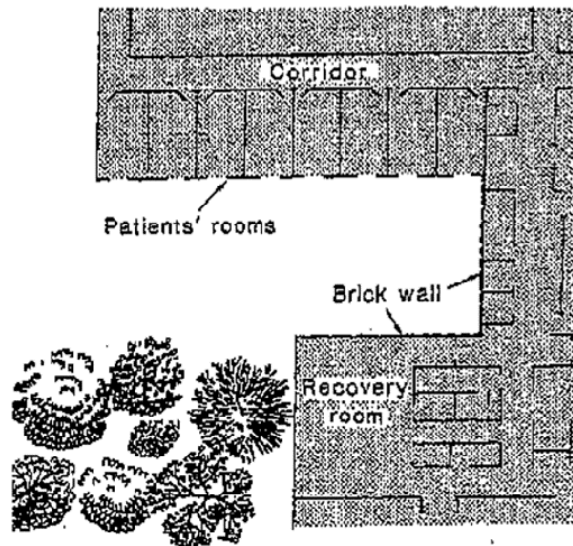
Plan of the second floor of the study hospital showing the trees versus wall window views of patients. Data were also collected for patients assigned to third-floor rooms. One room on each floor was excluded because portions of both the trees and wall were visible from the windows. Architectural dimensions are not precisely to scale.
